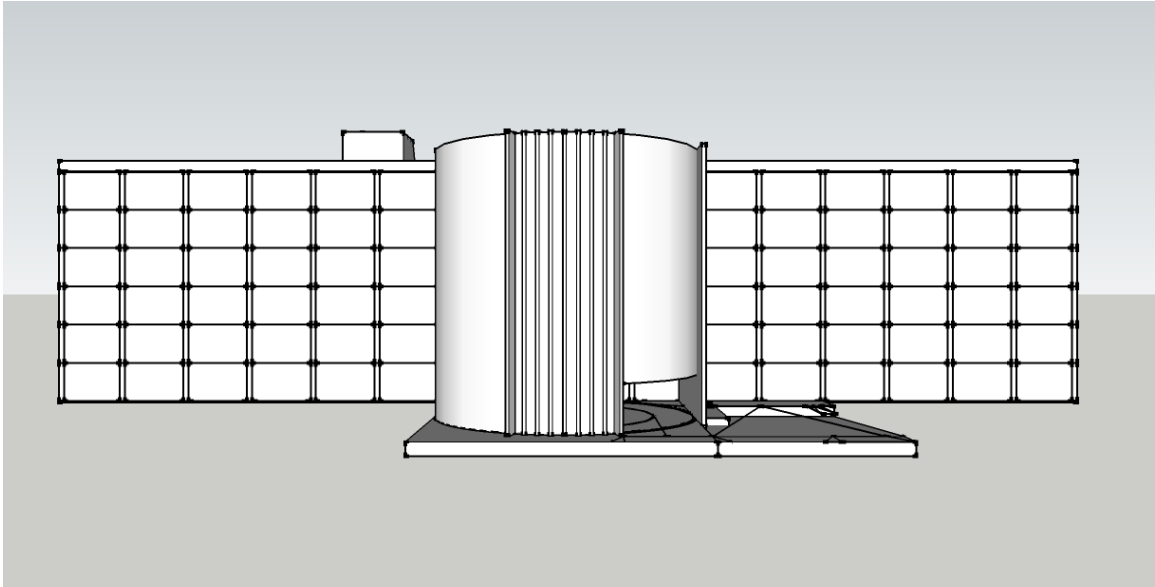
Massing Model of Existing Building - Kawaiahao Street Elevation²⁴¹
